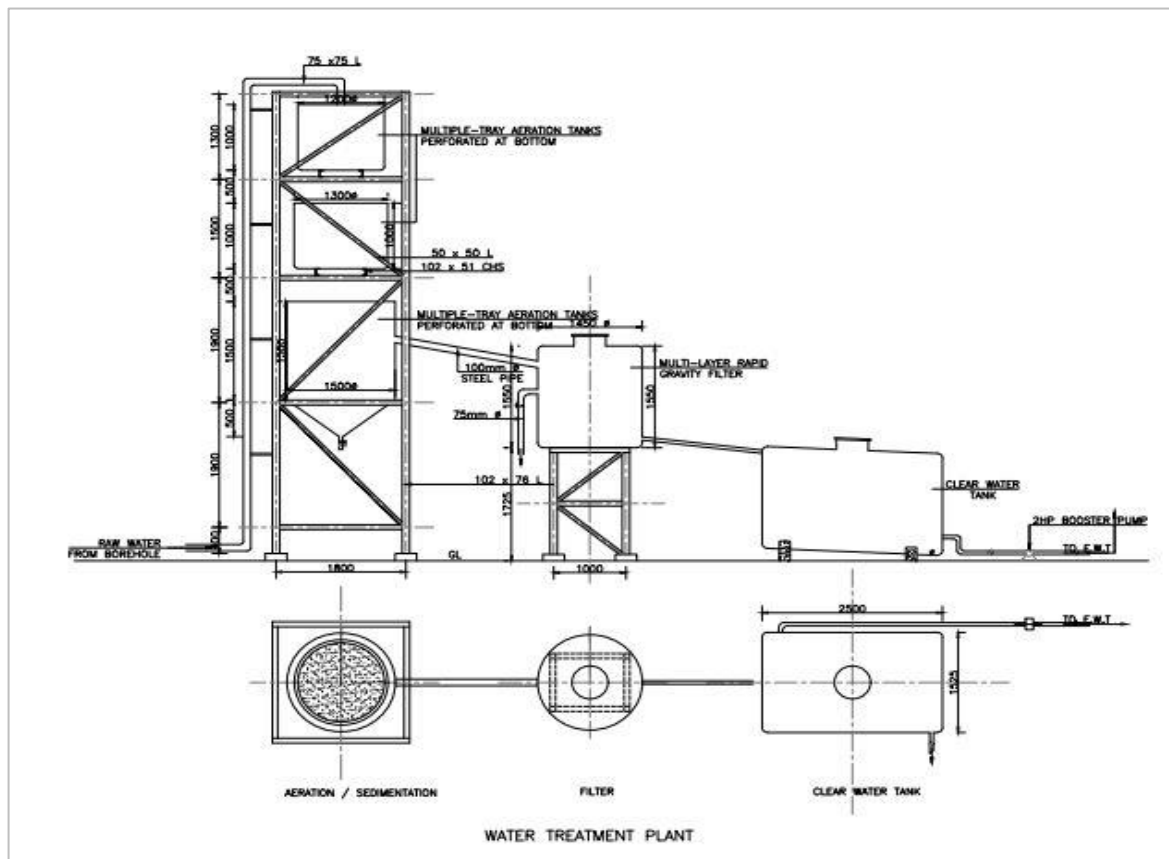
Plan and the cross-sectional drawing of the treatment plan
